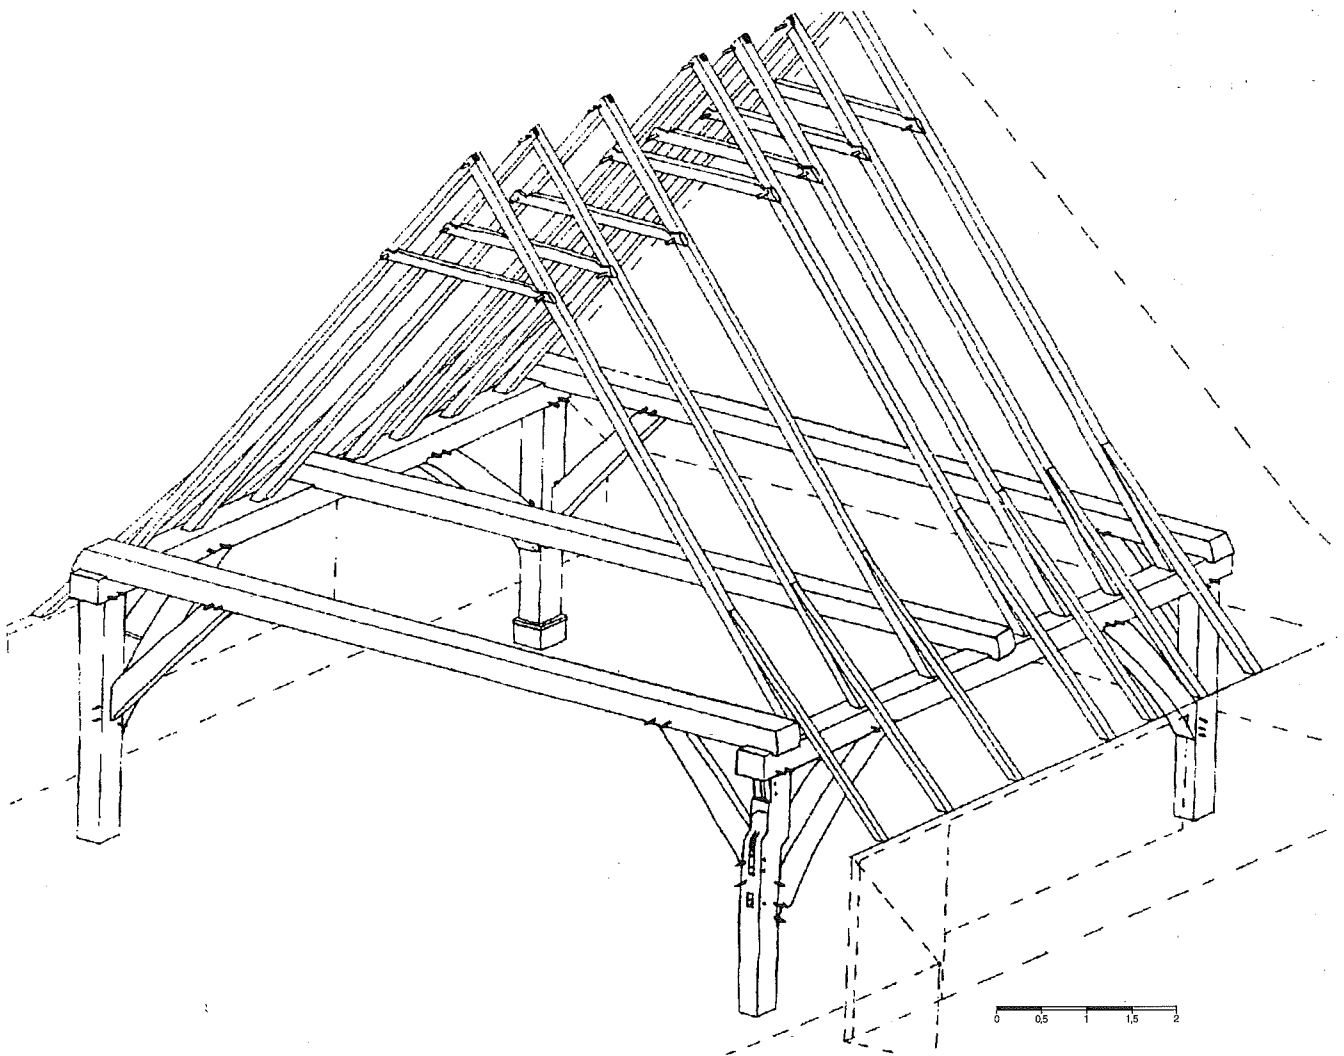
Reconstruction of the medieval living section of the Witterhaar house.
